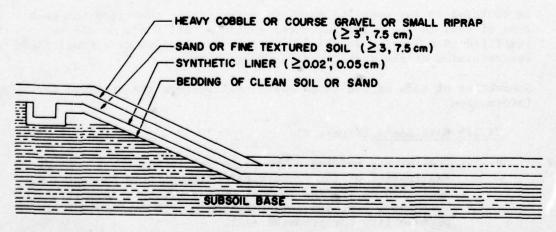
Cross-section of pond sealed with synthetic liner (Section 94.223)
